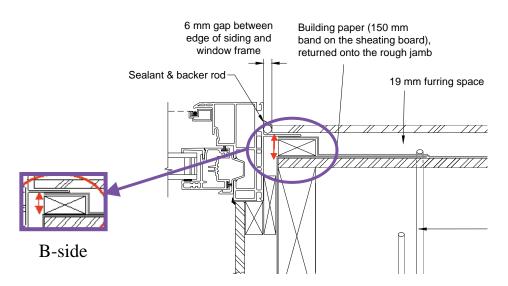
Base practice Construction W3 (Table 1) – Horizontal Sectional view of Wall-Window Interface at Jamb
